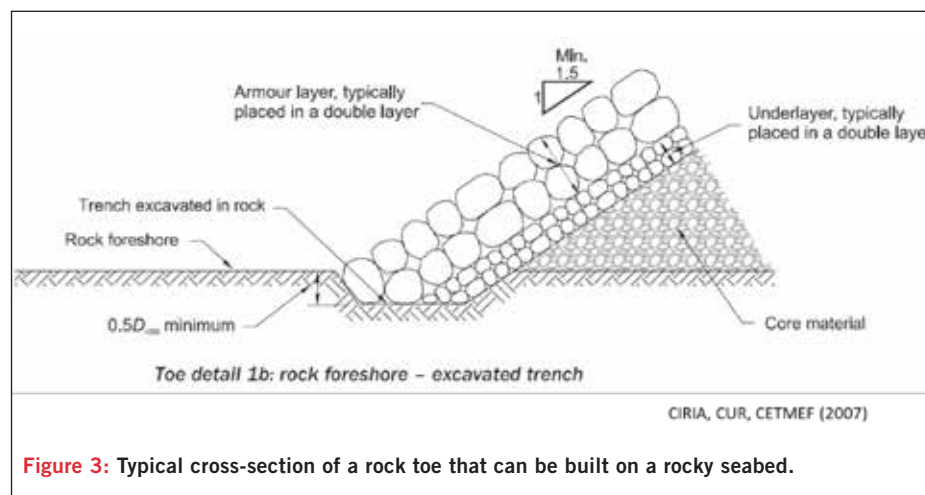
Typical cross-section of a rock toe that can be built on a rocky seabed.
